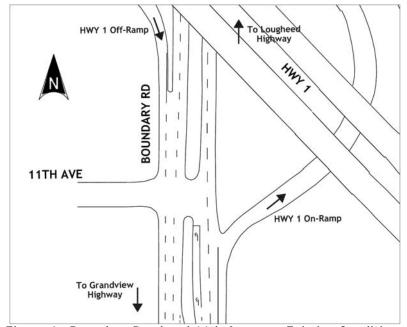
Boundary Road and 11th Avenue - Existing Conditions
